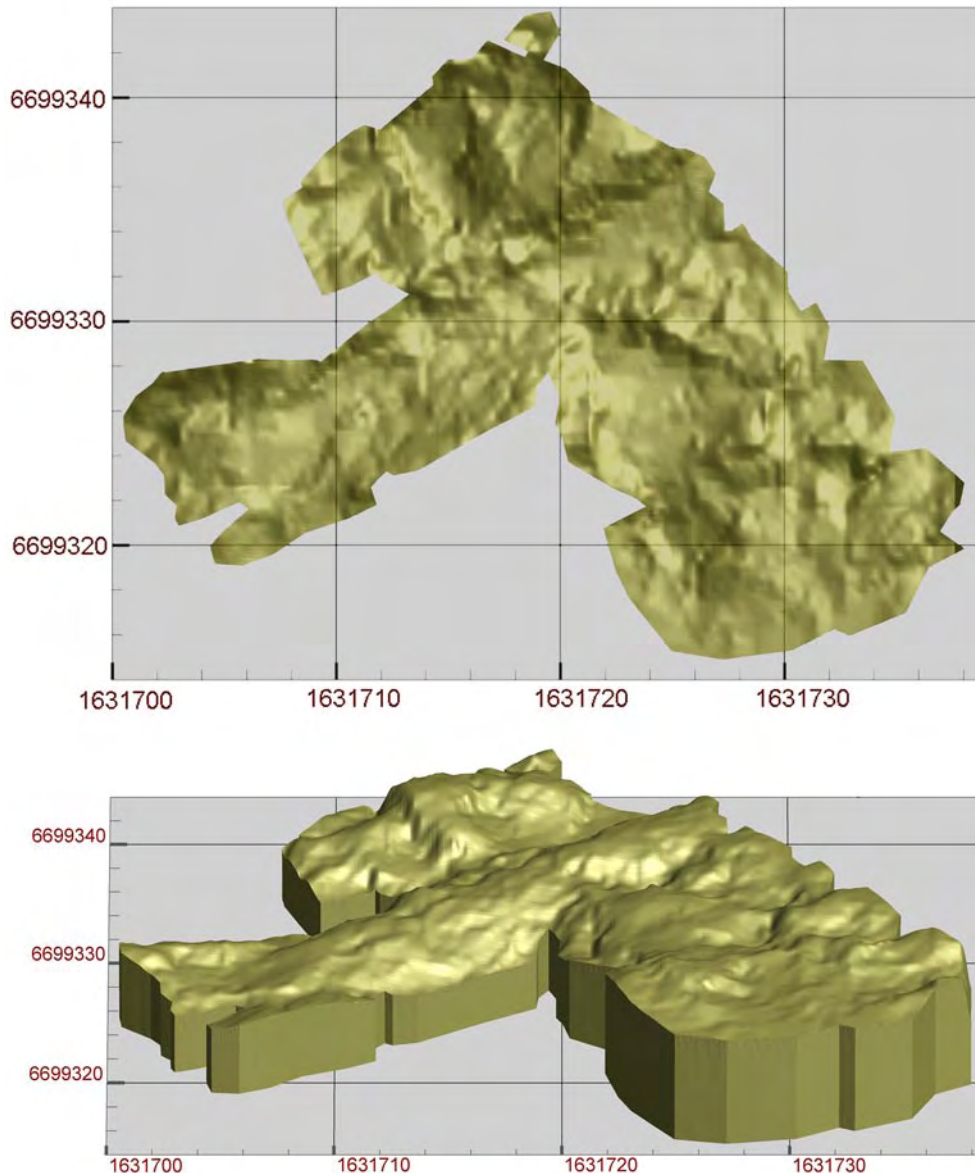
Geometry of the excavation at drill site 5, as obtained from detailed surveying. Upper: Plan view. Lower: Perspective from south.
